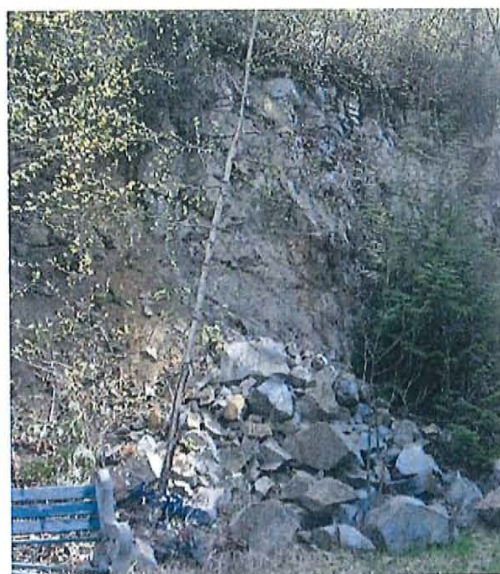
Bedrock outcrop at the site, facing east from the bottom of the lower bench.
